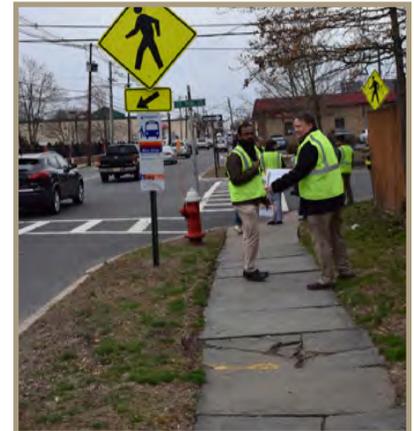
Cracked and raised slate sidewalks, looking westward at the intersection of St. Paul Street and North Avenue.
